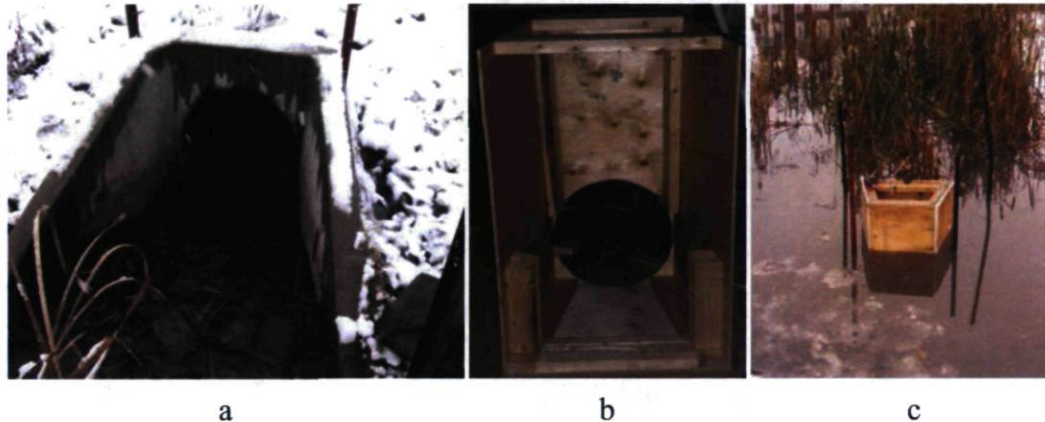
(a) Original outlet structure; (b) Outlet control structure (without front gate); (c) New outlet structure
